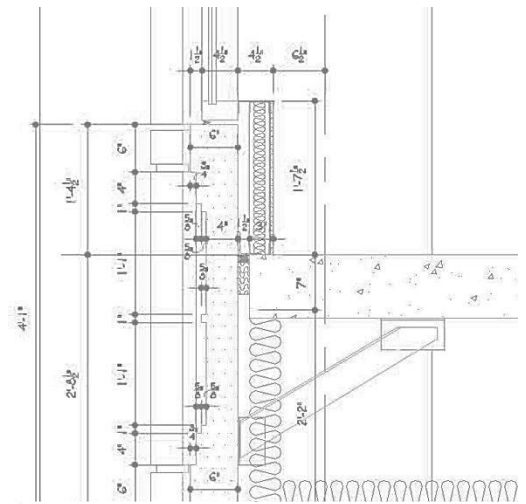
Wall Elevation Section - by Cagley and Assoc.
